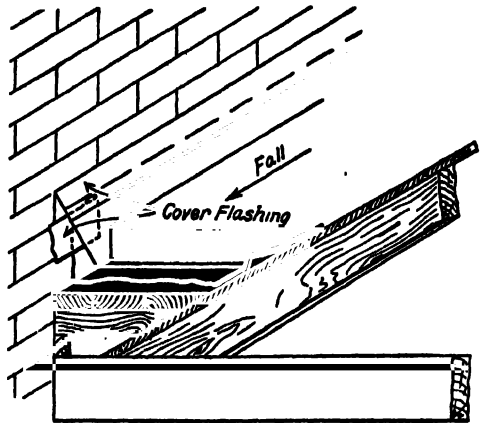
Parapet gutter formed where lower edge of pitched roof abuts a wall; drips are 2 to 3 in. deep; tilt fillets under slates ensure watertight joint to lead; lead is carried up slope to vertical height equal to that of upstand against wall; upstand is protected by cover flashing (see Fig. 7, p. 487, and also Figs. 1-5, pp. 339-340).
